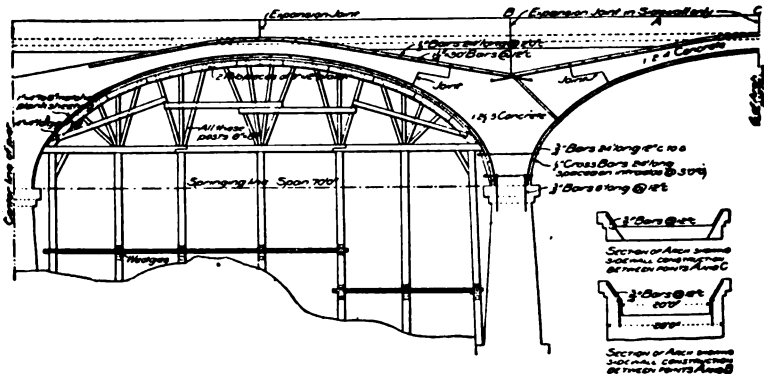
Southern Railway Bridge, Austell, Ga.
